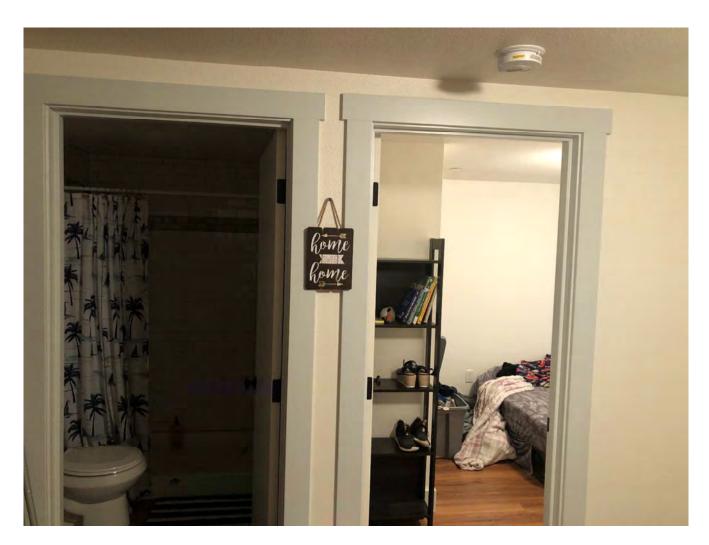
(After). Newton Apartments, Basement apartment (former boiler room and utilities area). Looking southeast. August 2020. Source: Stephen Day Architecture.
